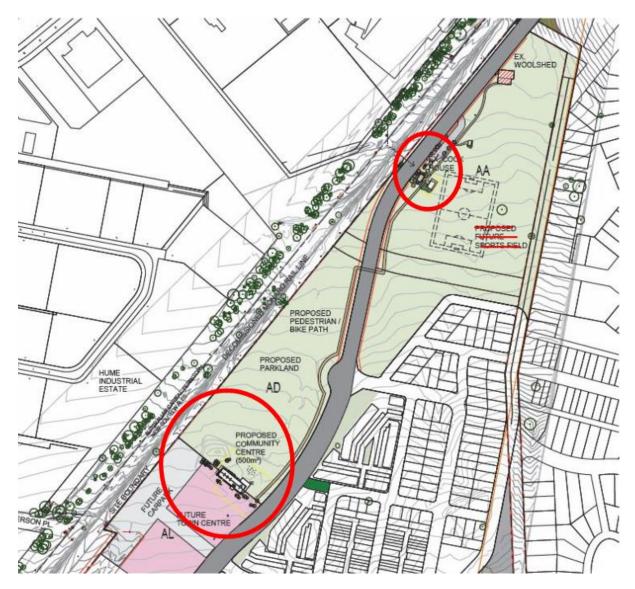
Site Plan in Context of New Residential Subdivision (Source: SEE prepared by Elton Consulting)
